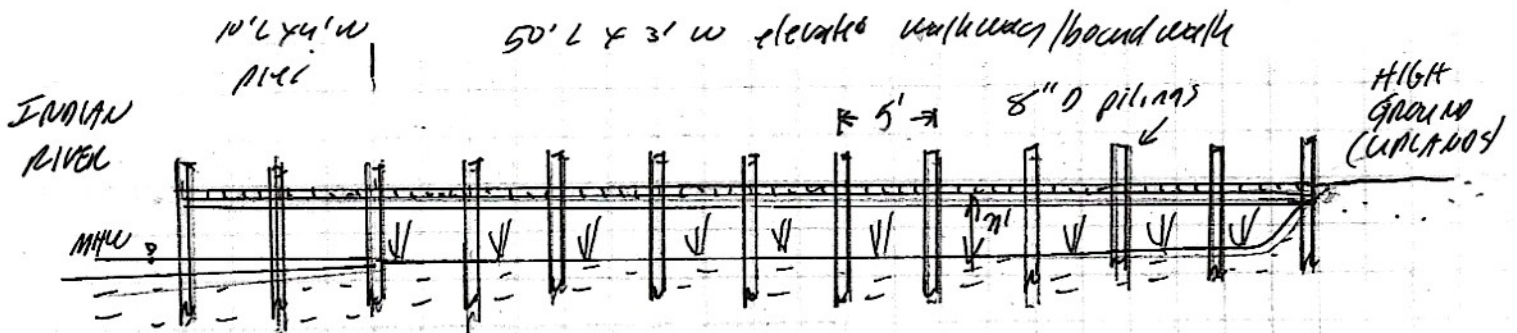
Plan view and cross-section sketches of proposed project. Sketches for permit application purposes only.
